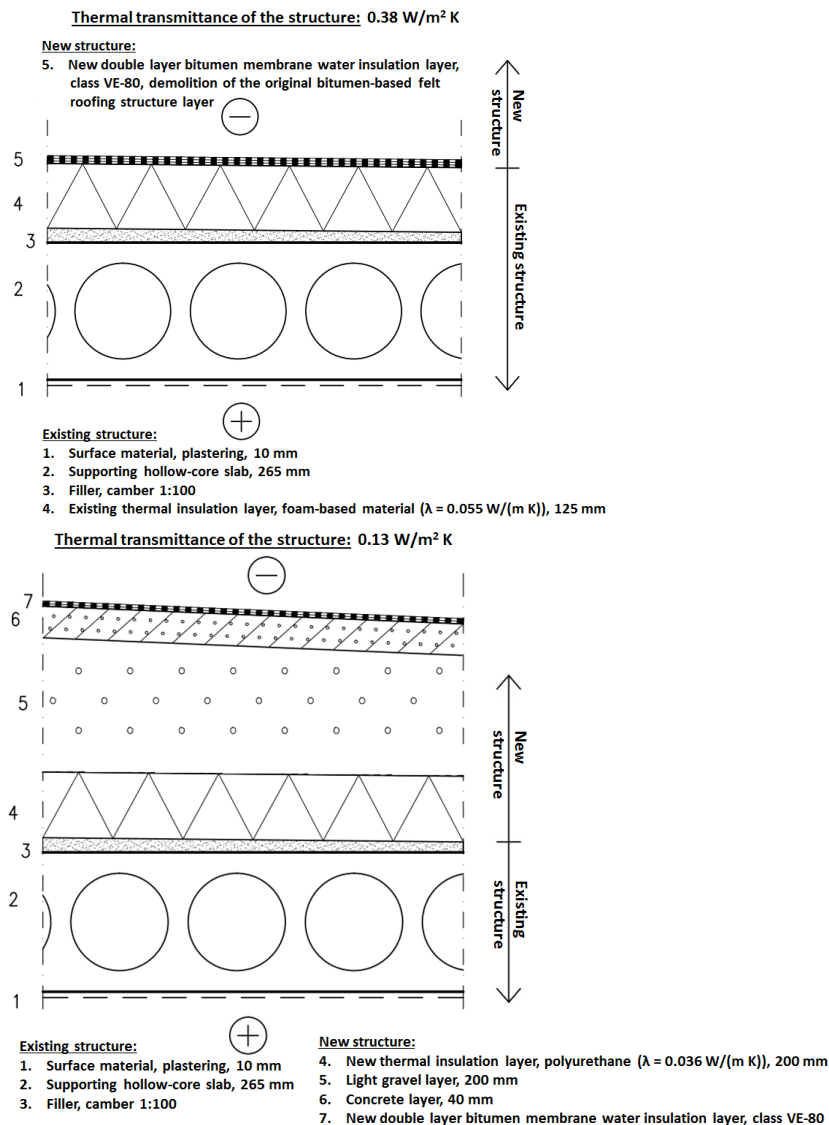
The structure details of the basic refurbishment (above) and renovated (below) roof with additional thermal insulation, according to the selected renovation methods with the new and existing structure layers presented.
